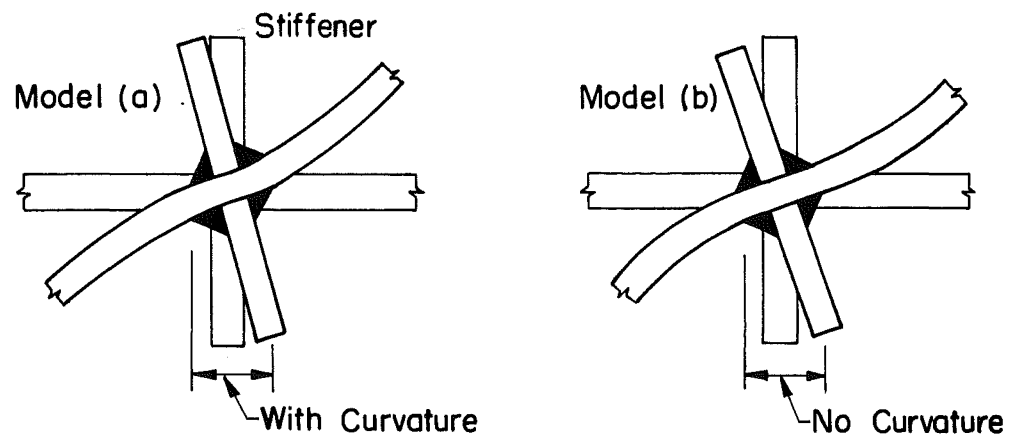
Plate Bending Stresses at Toe of Fillet Weld Along Stiffener
